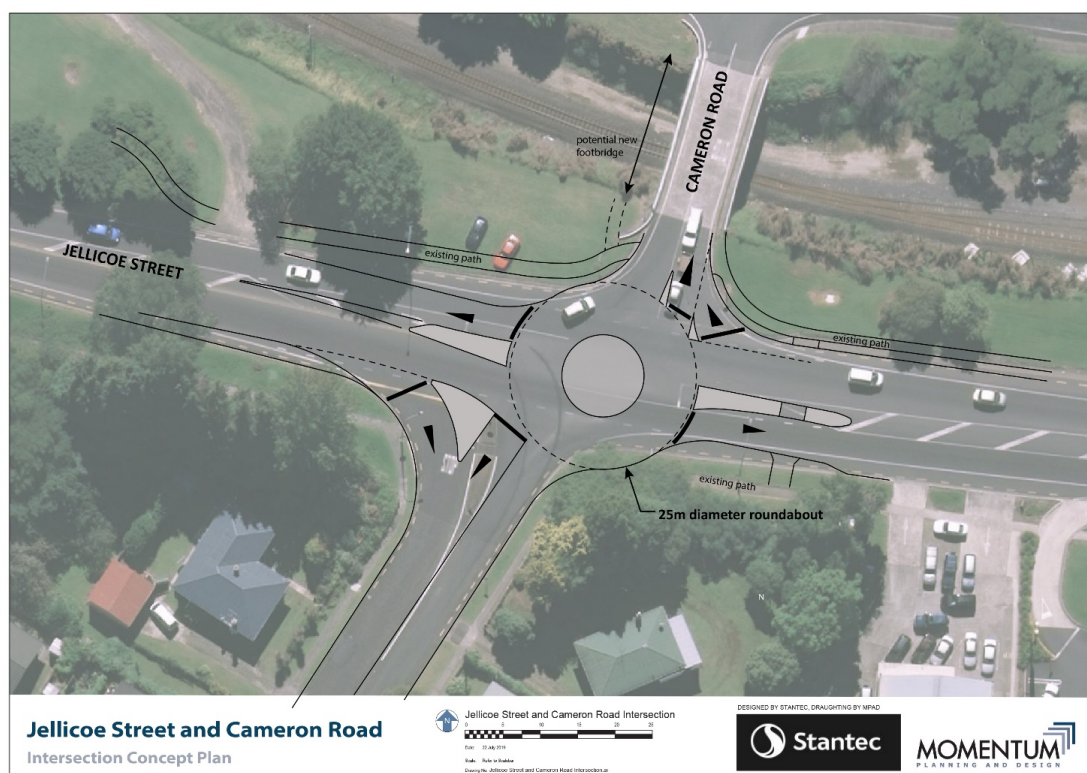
Jellicoe Street and Cameron Road Intersection Design
